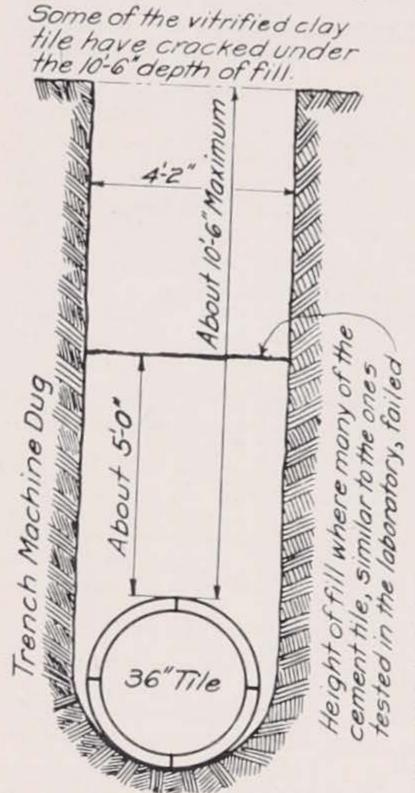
Cracking of 36 Inch Cement and Vitrified Clay Drain Tile during Construction, in Drainage District No. 29, Sac County, Iowa.
